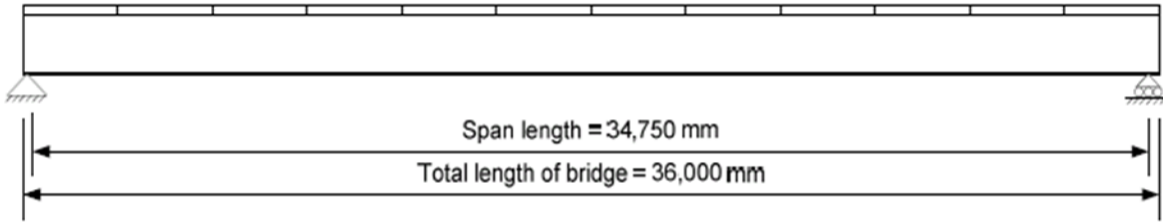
Support Conditions of Twin Girder Composite Bridge [Bowser 2010]
